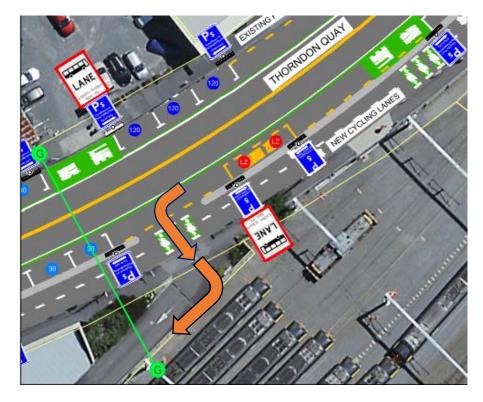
Excerpt from Plan 7, Designing for safe truck access
